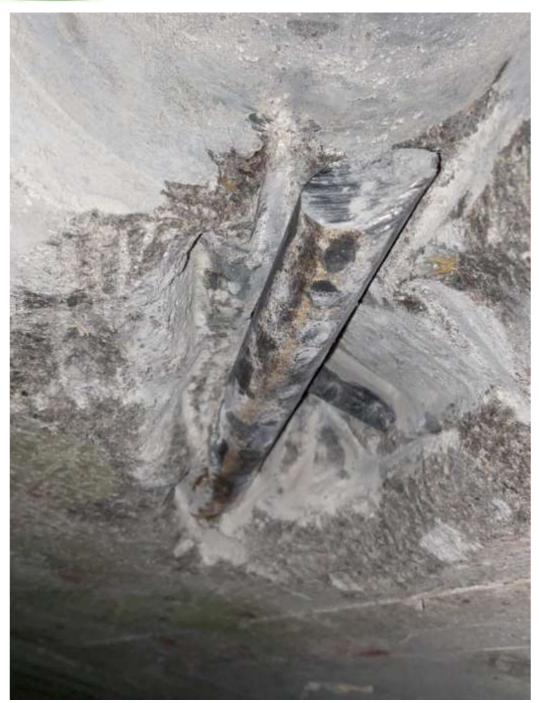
Exposed Longitudinal and Transverse Reinforcement
